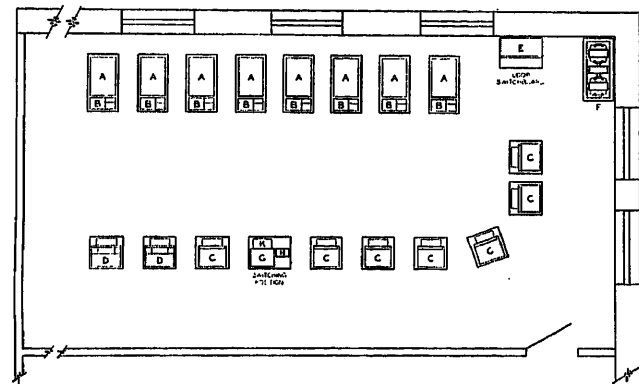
TELETYPESWRITER EQUIPMENT LAYOUT IN LARGE OFFICE
